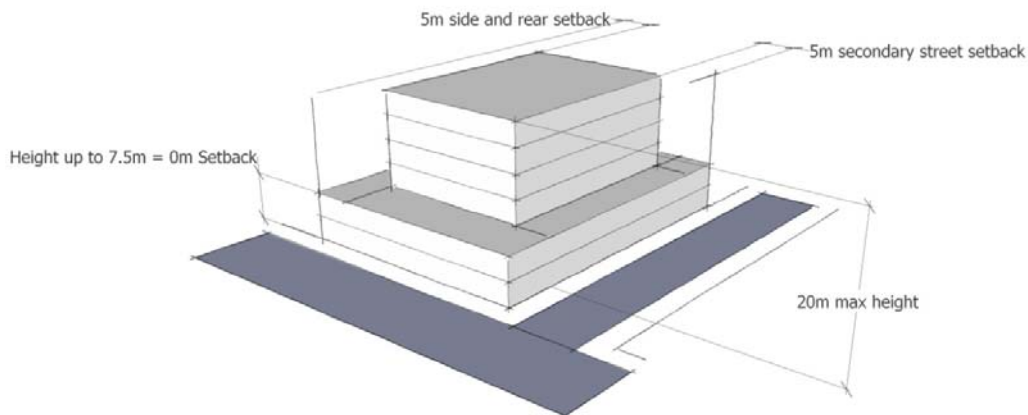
a – Height, setbacks and site cover for buildings in Precinct 1 – Edmonton Centre Core
